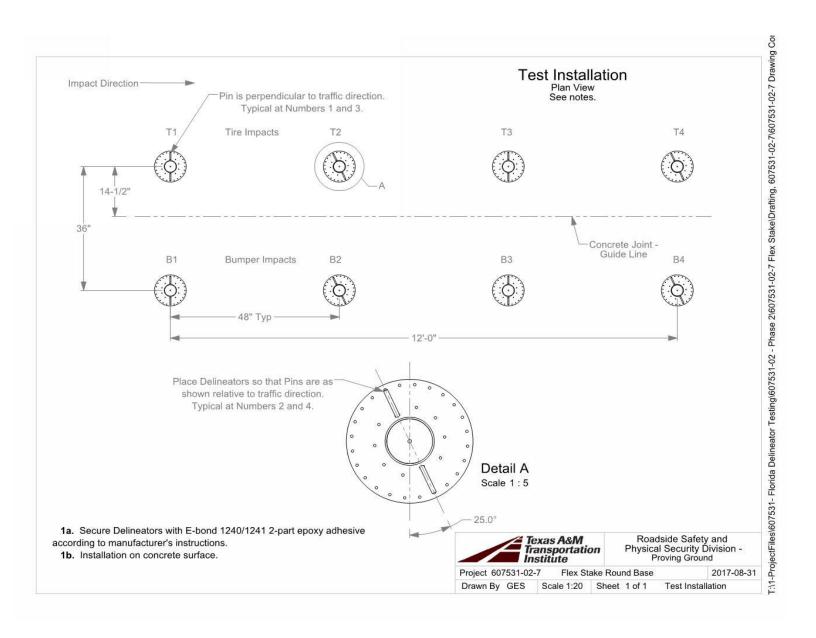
607531-02-7 Test Setup on Concrete Surface.
